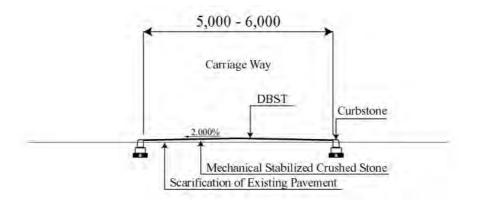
Standard Cross-Section: Police Line Road in Betio
